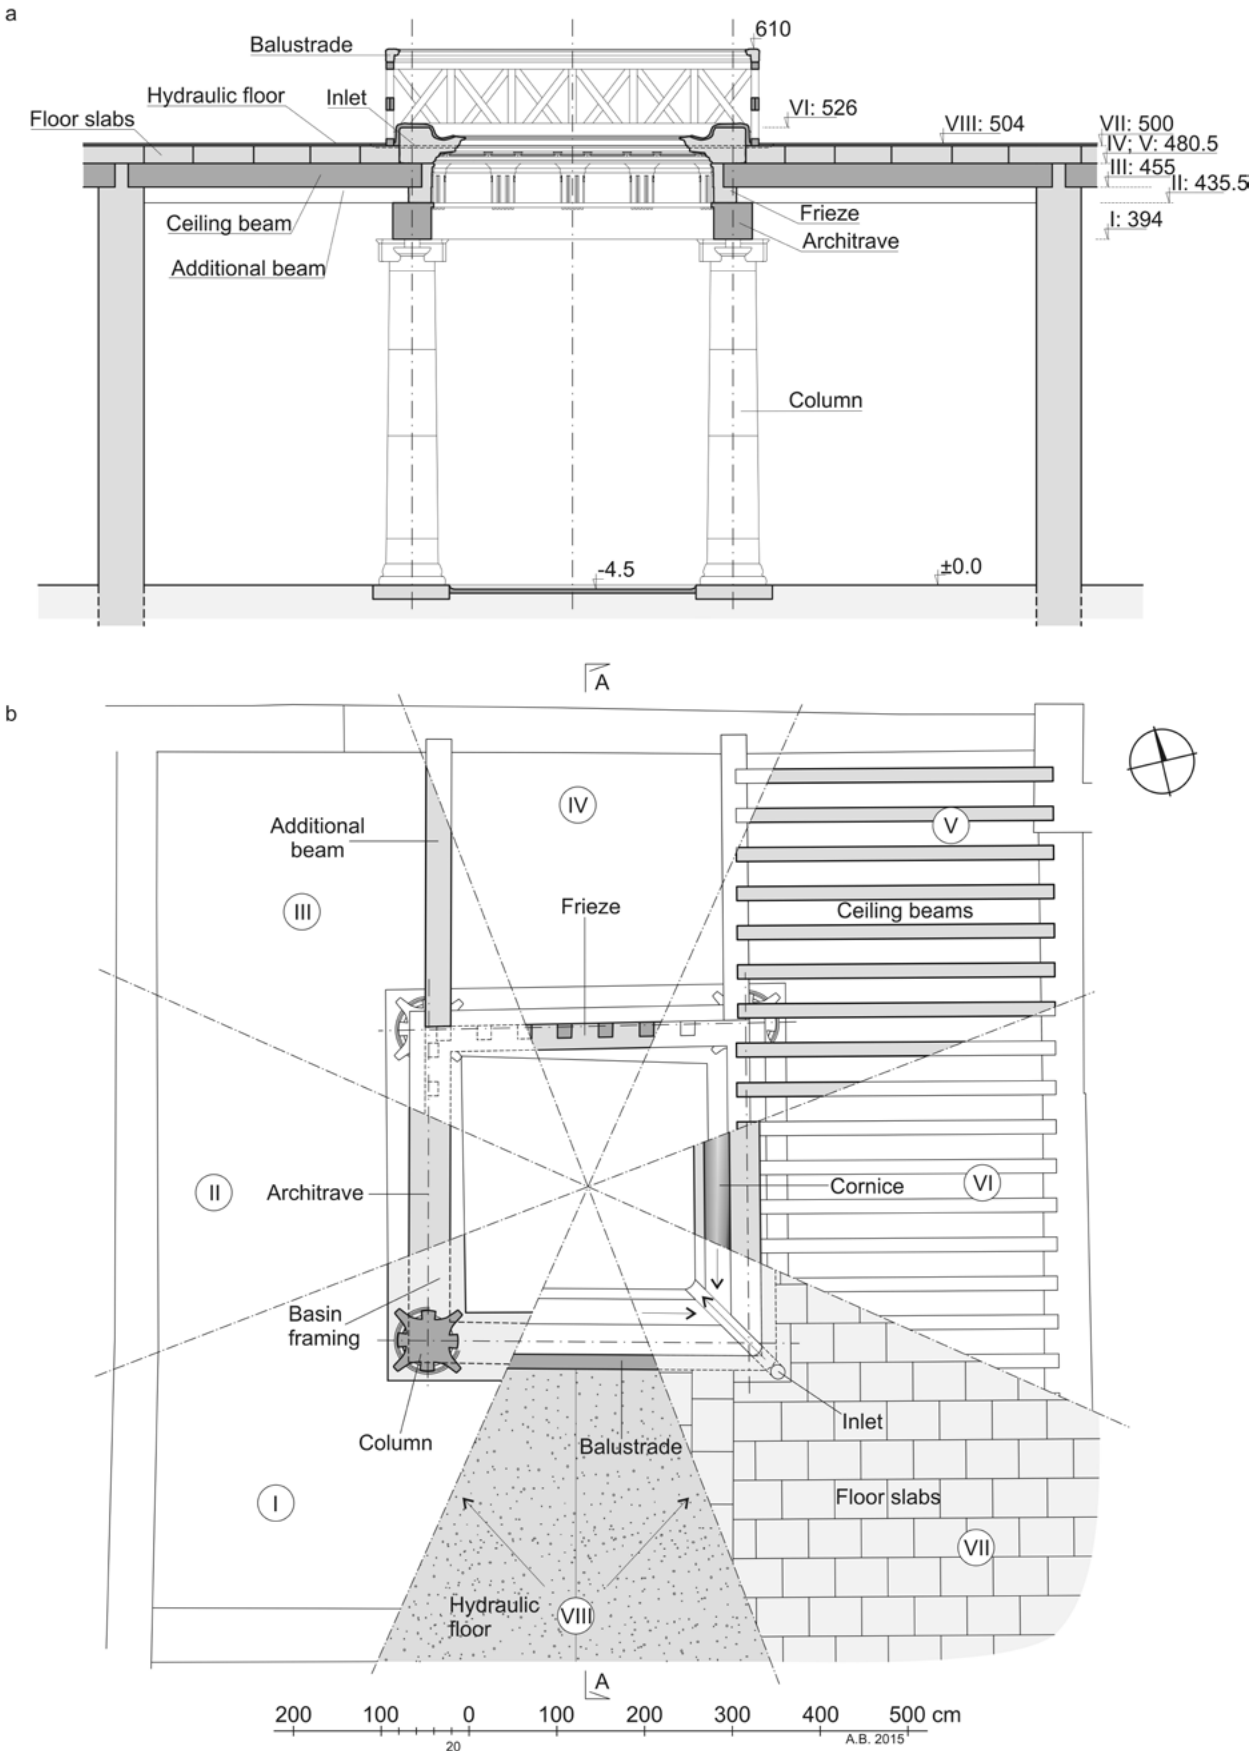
Reconstruction of the early phase of the *tetrastylus* from the ‘Hellenistic House’ with levels of: I – columns; II – architraves; III – additional beams; IV – frieze; V – ceiling beams; VI – cornice; VII – floor slabs; VIII – hydraulic floor and balustrade; a. section; b. plan (Drawing A. Brzozowska)
